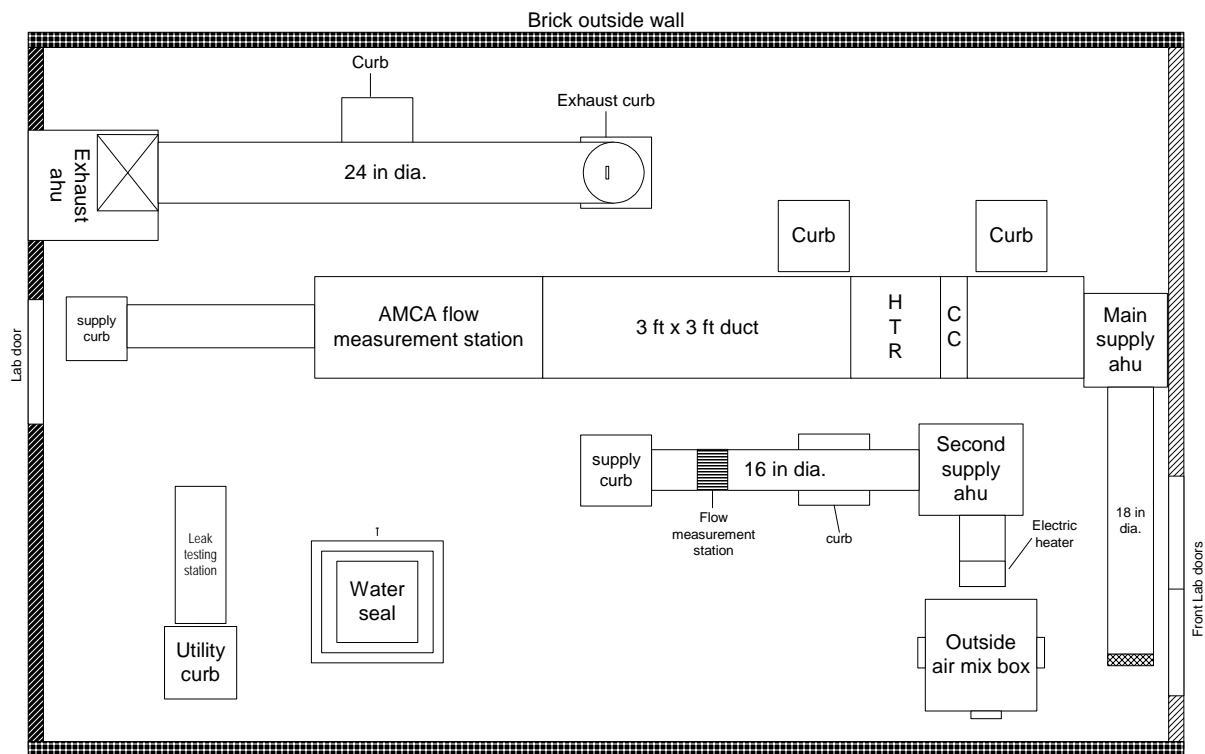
Plan View of the Laboratory Roof with HVAC Equipment
